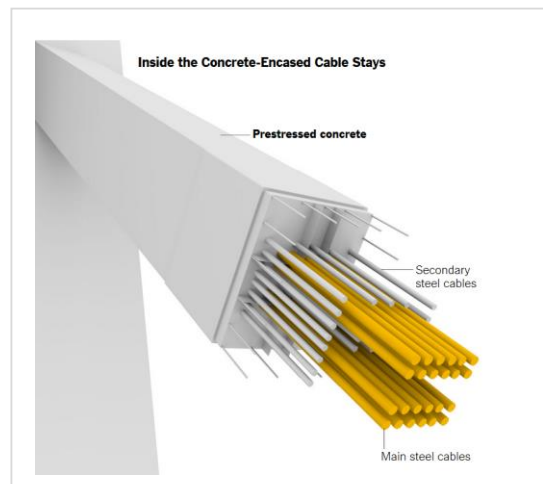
Concrete-Encased Cable Stays. Source: Media.
